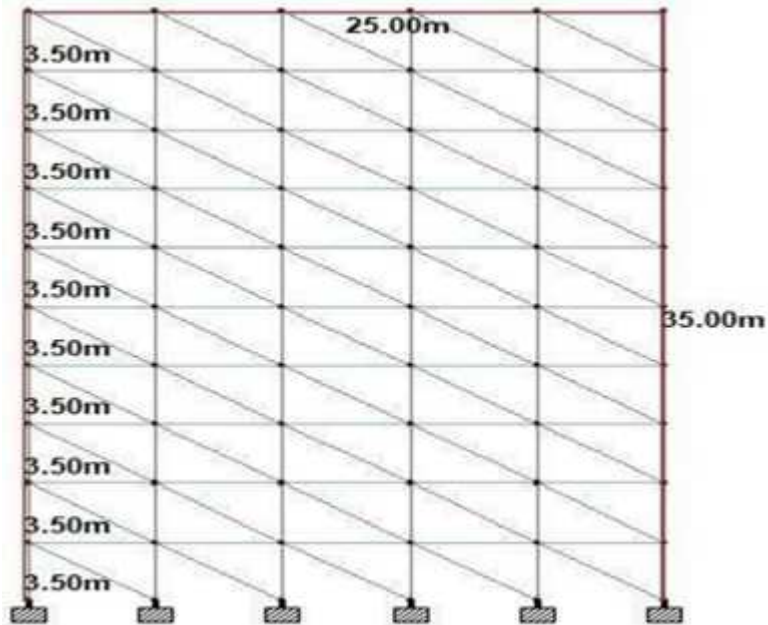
Elevation of flat slab building having 50 % infill walls
